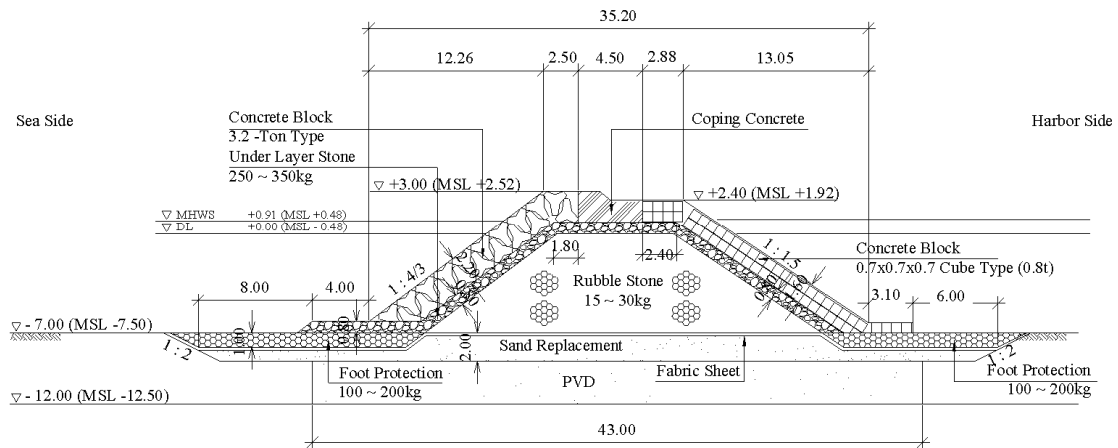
Typical Section of Breakwater in Cilamaya New Terminal
